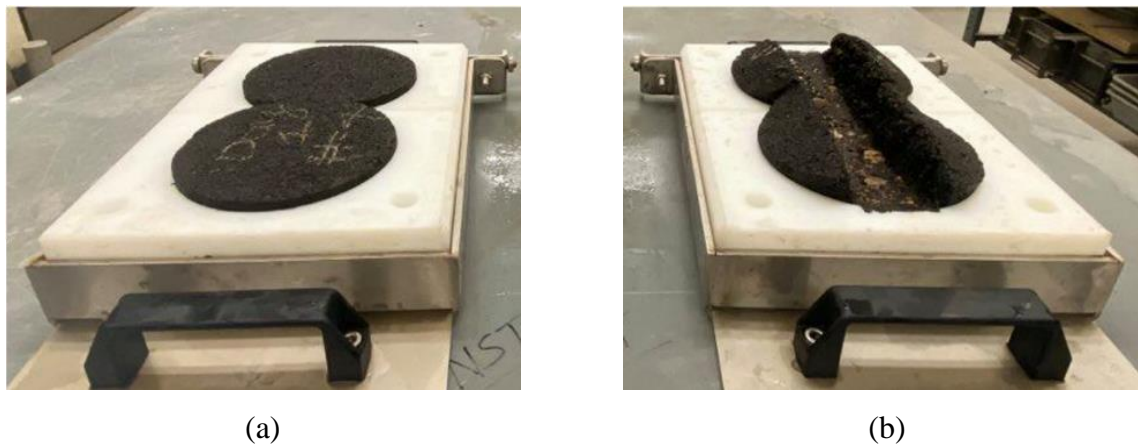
HWT test specimens (a) before testing, and (b) after testing.
